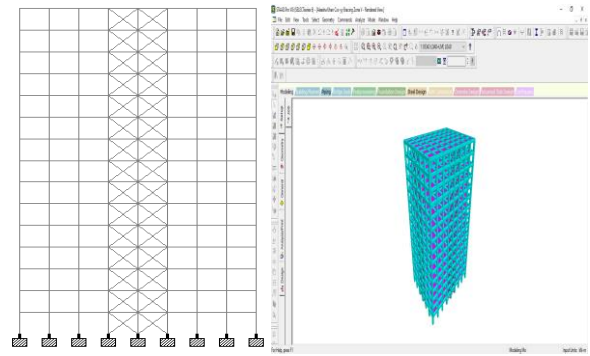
Framed building with Bracing at the exterior side along X and z-direction.
